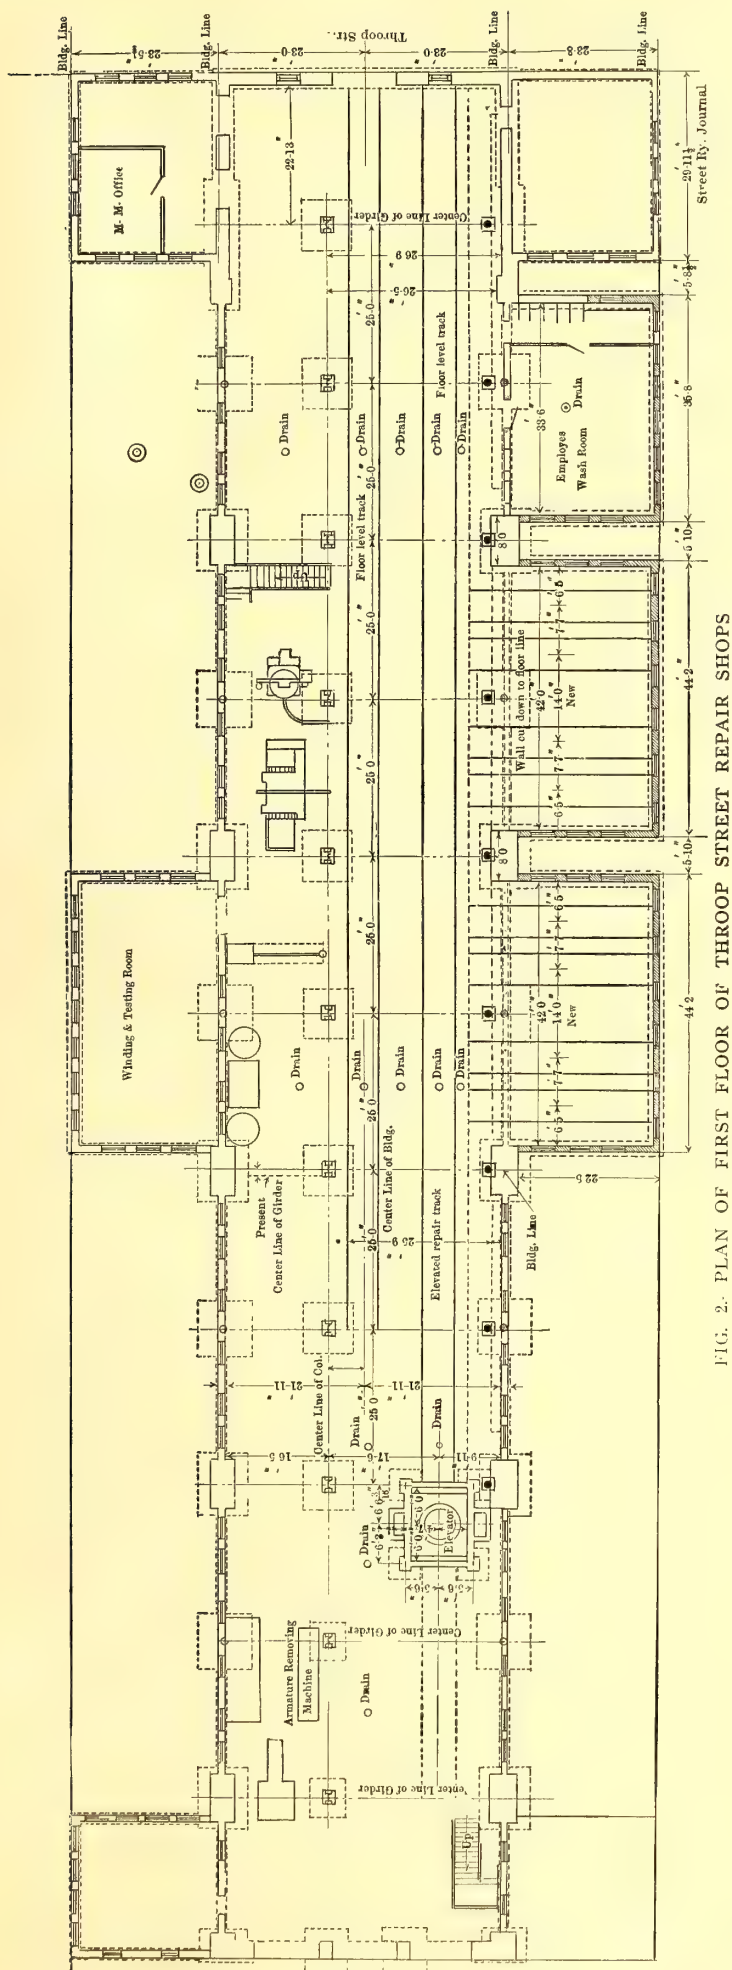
PLAN OF FIRST FLOOR OF THROOP STREET REPAIR SHOPS
